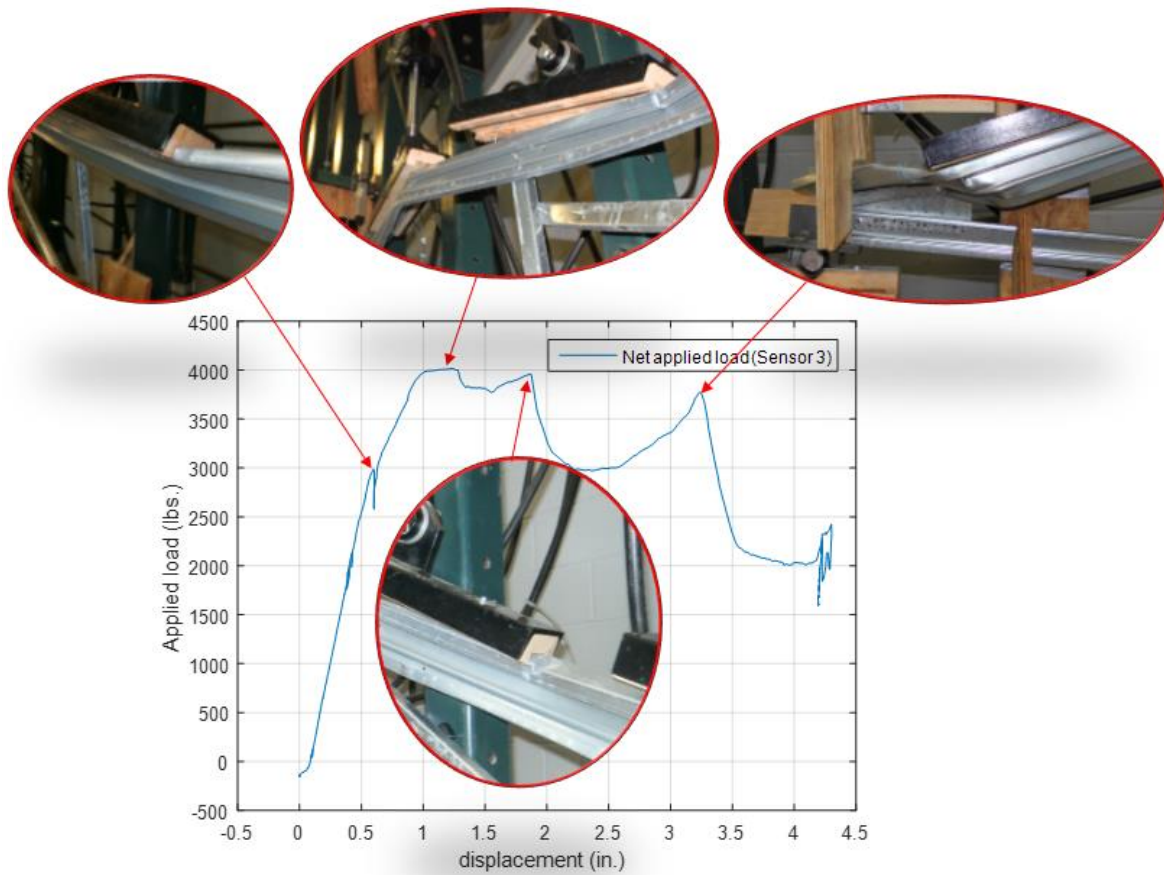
TrusSteel Testing summary of midpoint displacement sensors with failure pictures at peak loads (TrusSteel Test #2)
